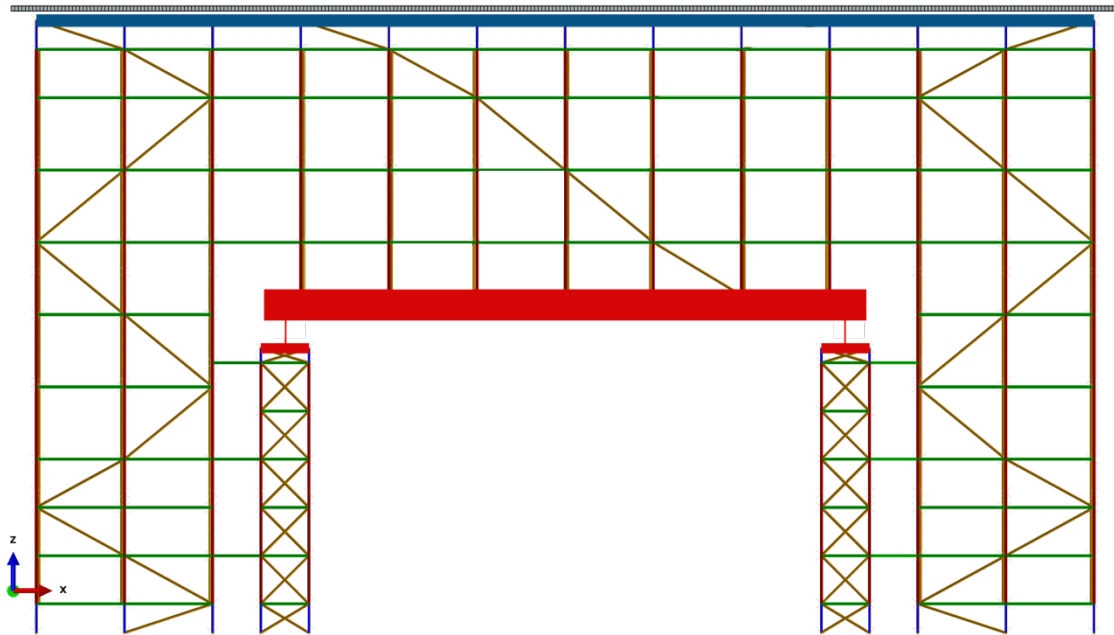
Reference example of a bridge falsework structure using steel girders (model M1).
